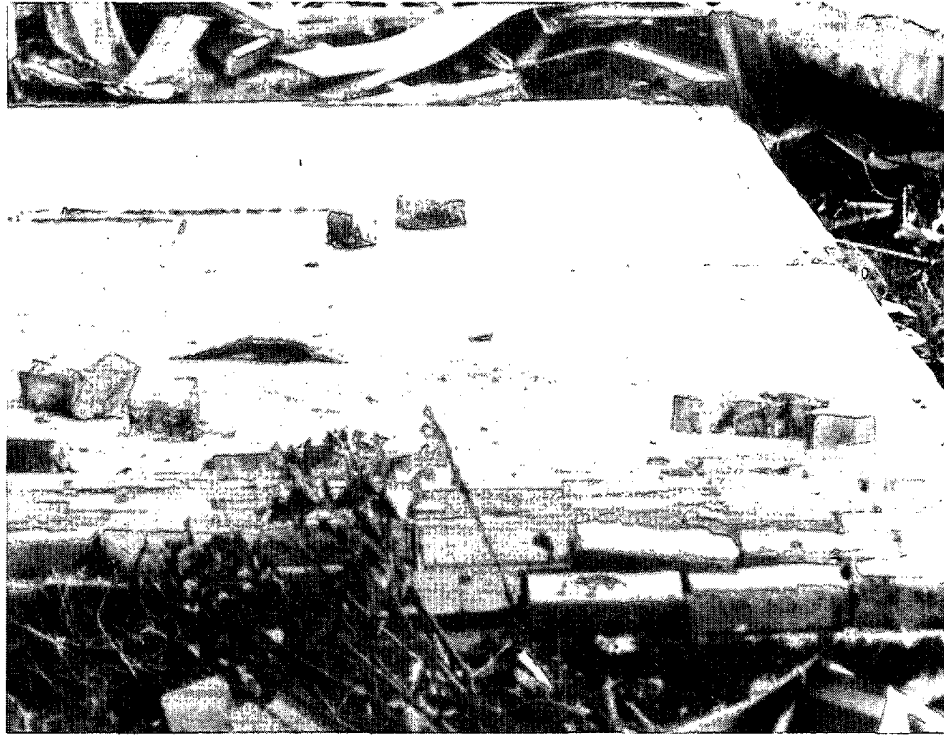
The roof on this house was not anchored very well and was uplifted and displaced during peripheral winds in the Mesquite, Texas tornado on December 13, 1984. Wind velocities less than 100 m.p.h. can cause such residential damage.
